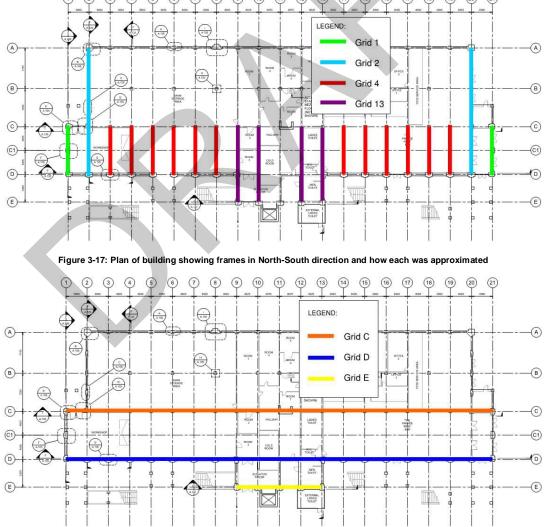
Plan of building showing frames in East-West direction and how each was approximated
